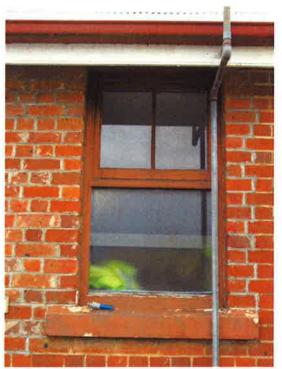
Original window opening to former stables (south elevation). Glass louvres have been replaced with a fixed sash.
